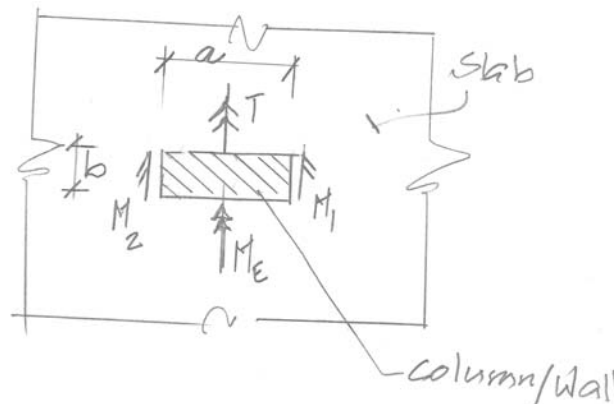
TRANSFER OF COLUMN/WALL MOMENT TO SLAB
